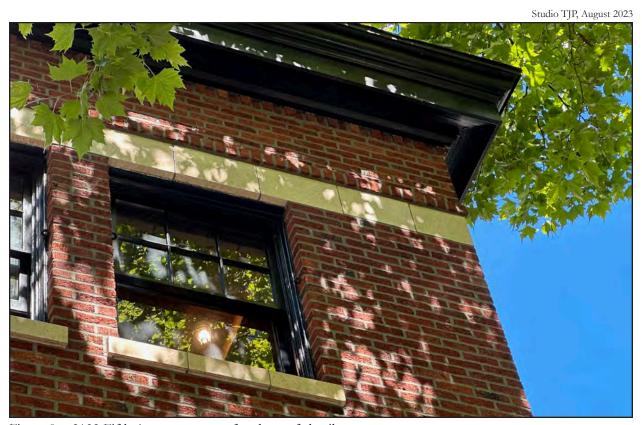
• 2132 Fifth Avenue, western façade, roof detail
